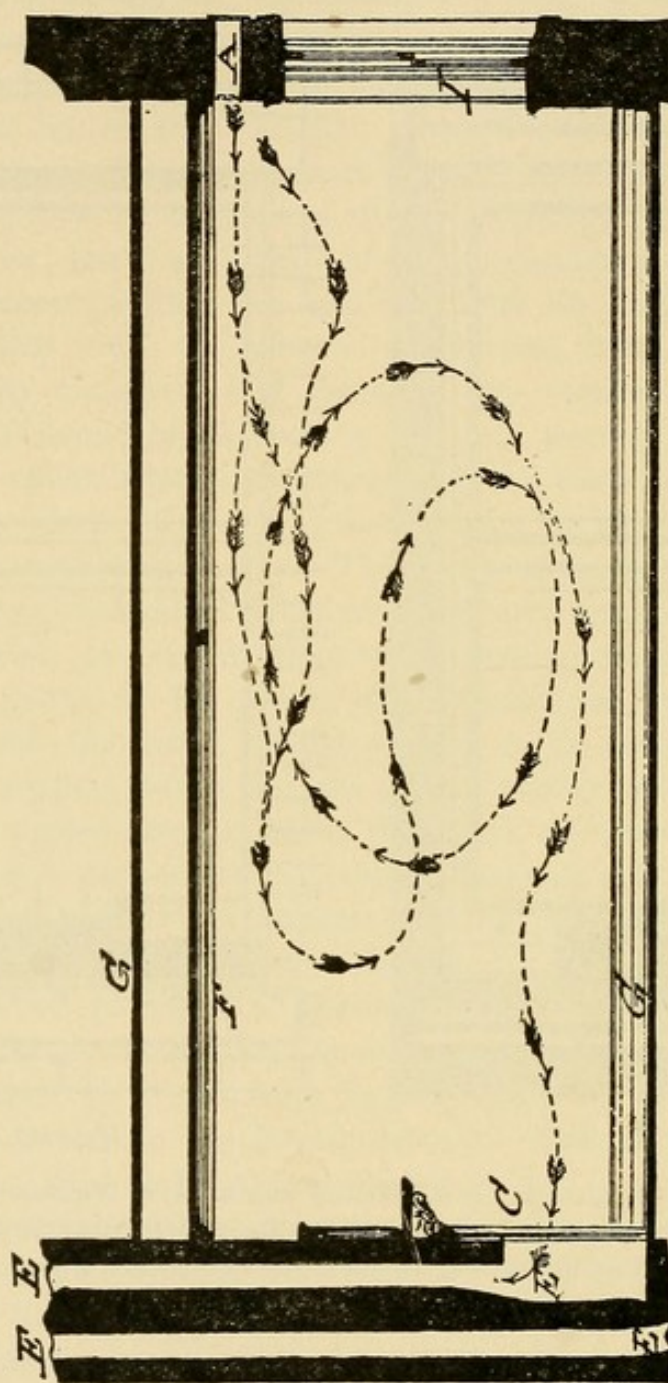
Ventilation of a Room Containing an Open Fireplace.
